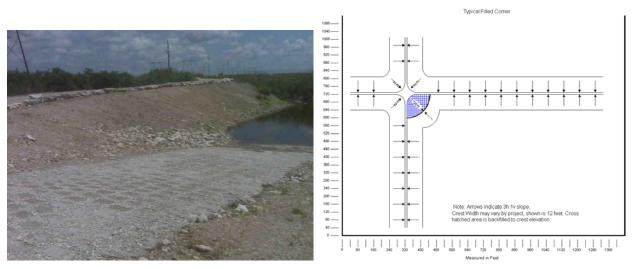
Example Articulated Block Boat Ramp and Filled Corner
